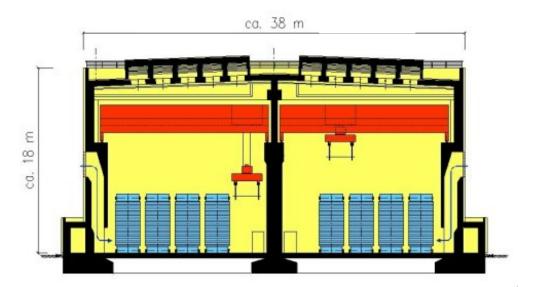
Storage building WTI-type: two storage areas, air inlets at both sides, outlets on the roof
